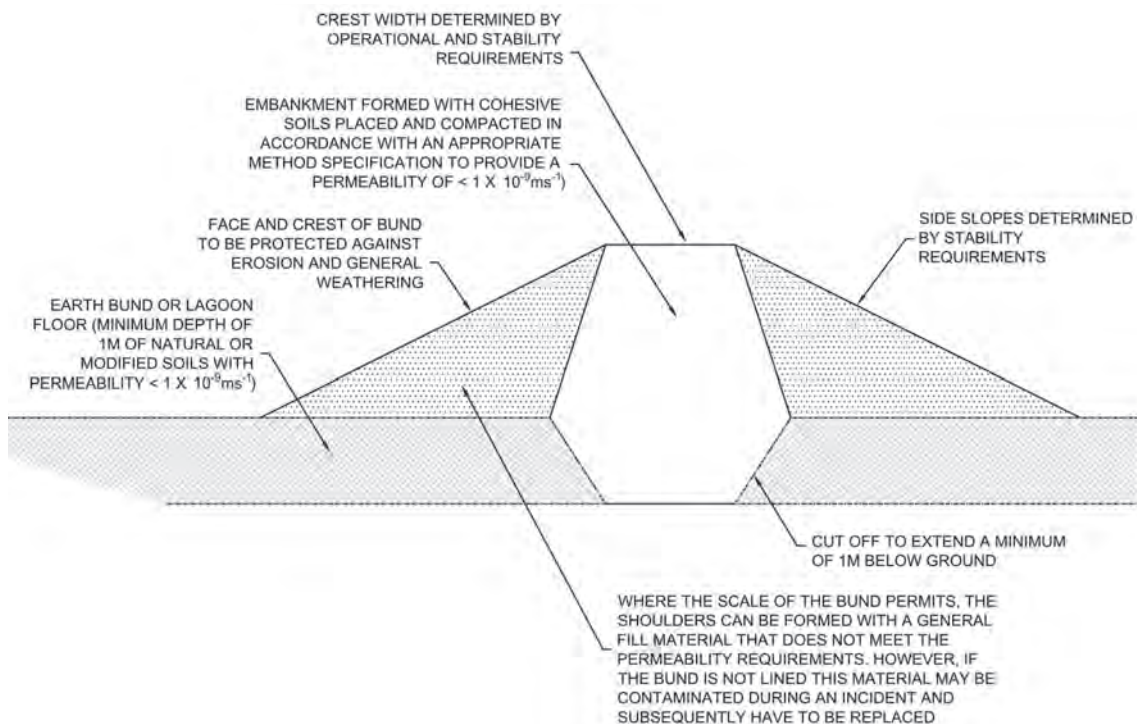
Typical earthwork or lagoon bund wall detail (see Section 8.10 for liner anchorage and protection details and pipe penetration details)
